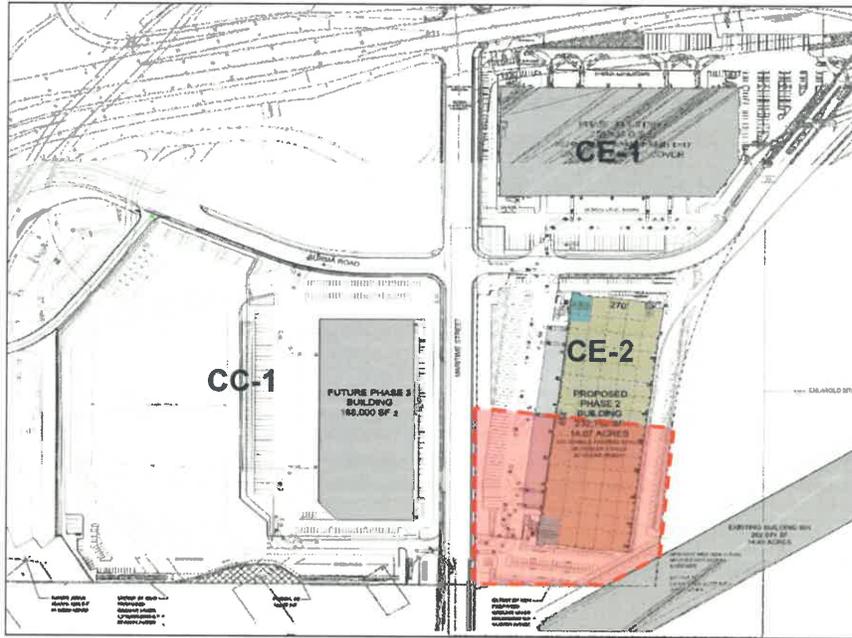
Site Plan – Overall Site showing building and Good Eggs' lease area subject to this Plan
